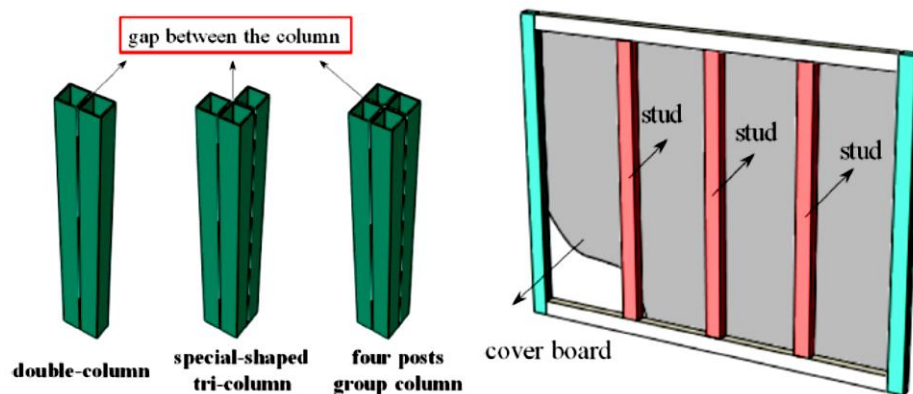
Group columns and steel stud wall in modular buildings (Deng et al., 2020) [6]
